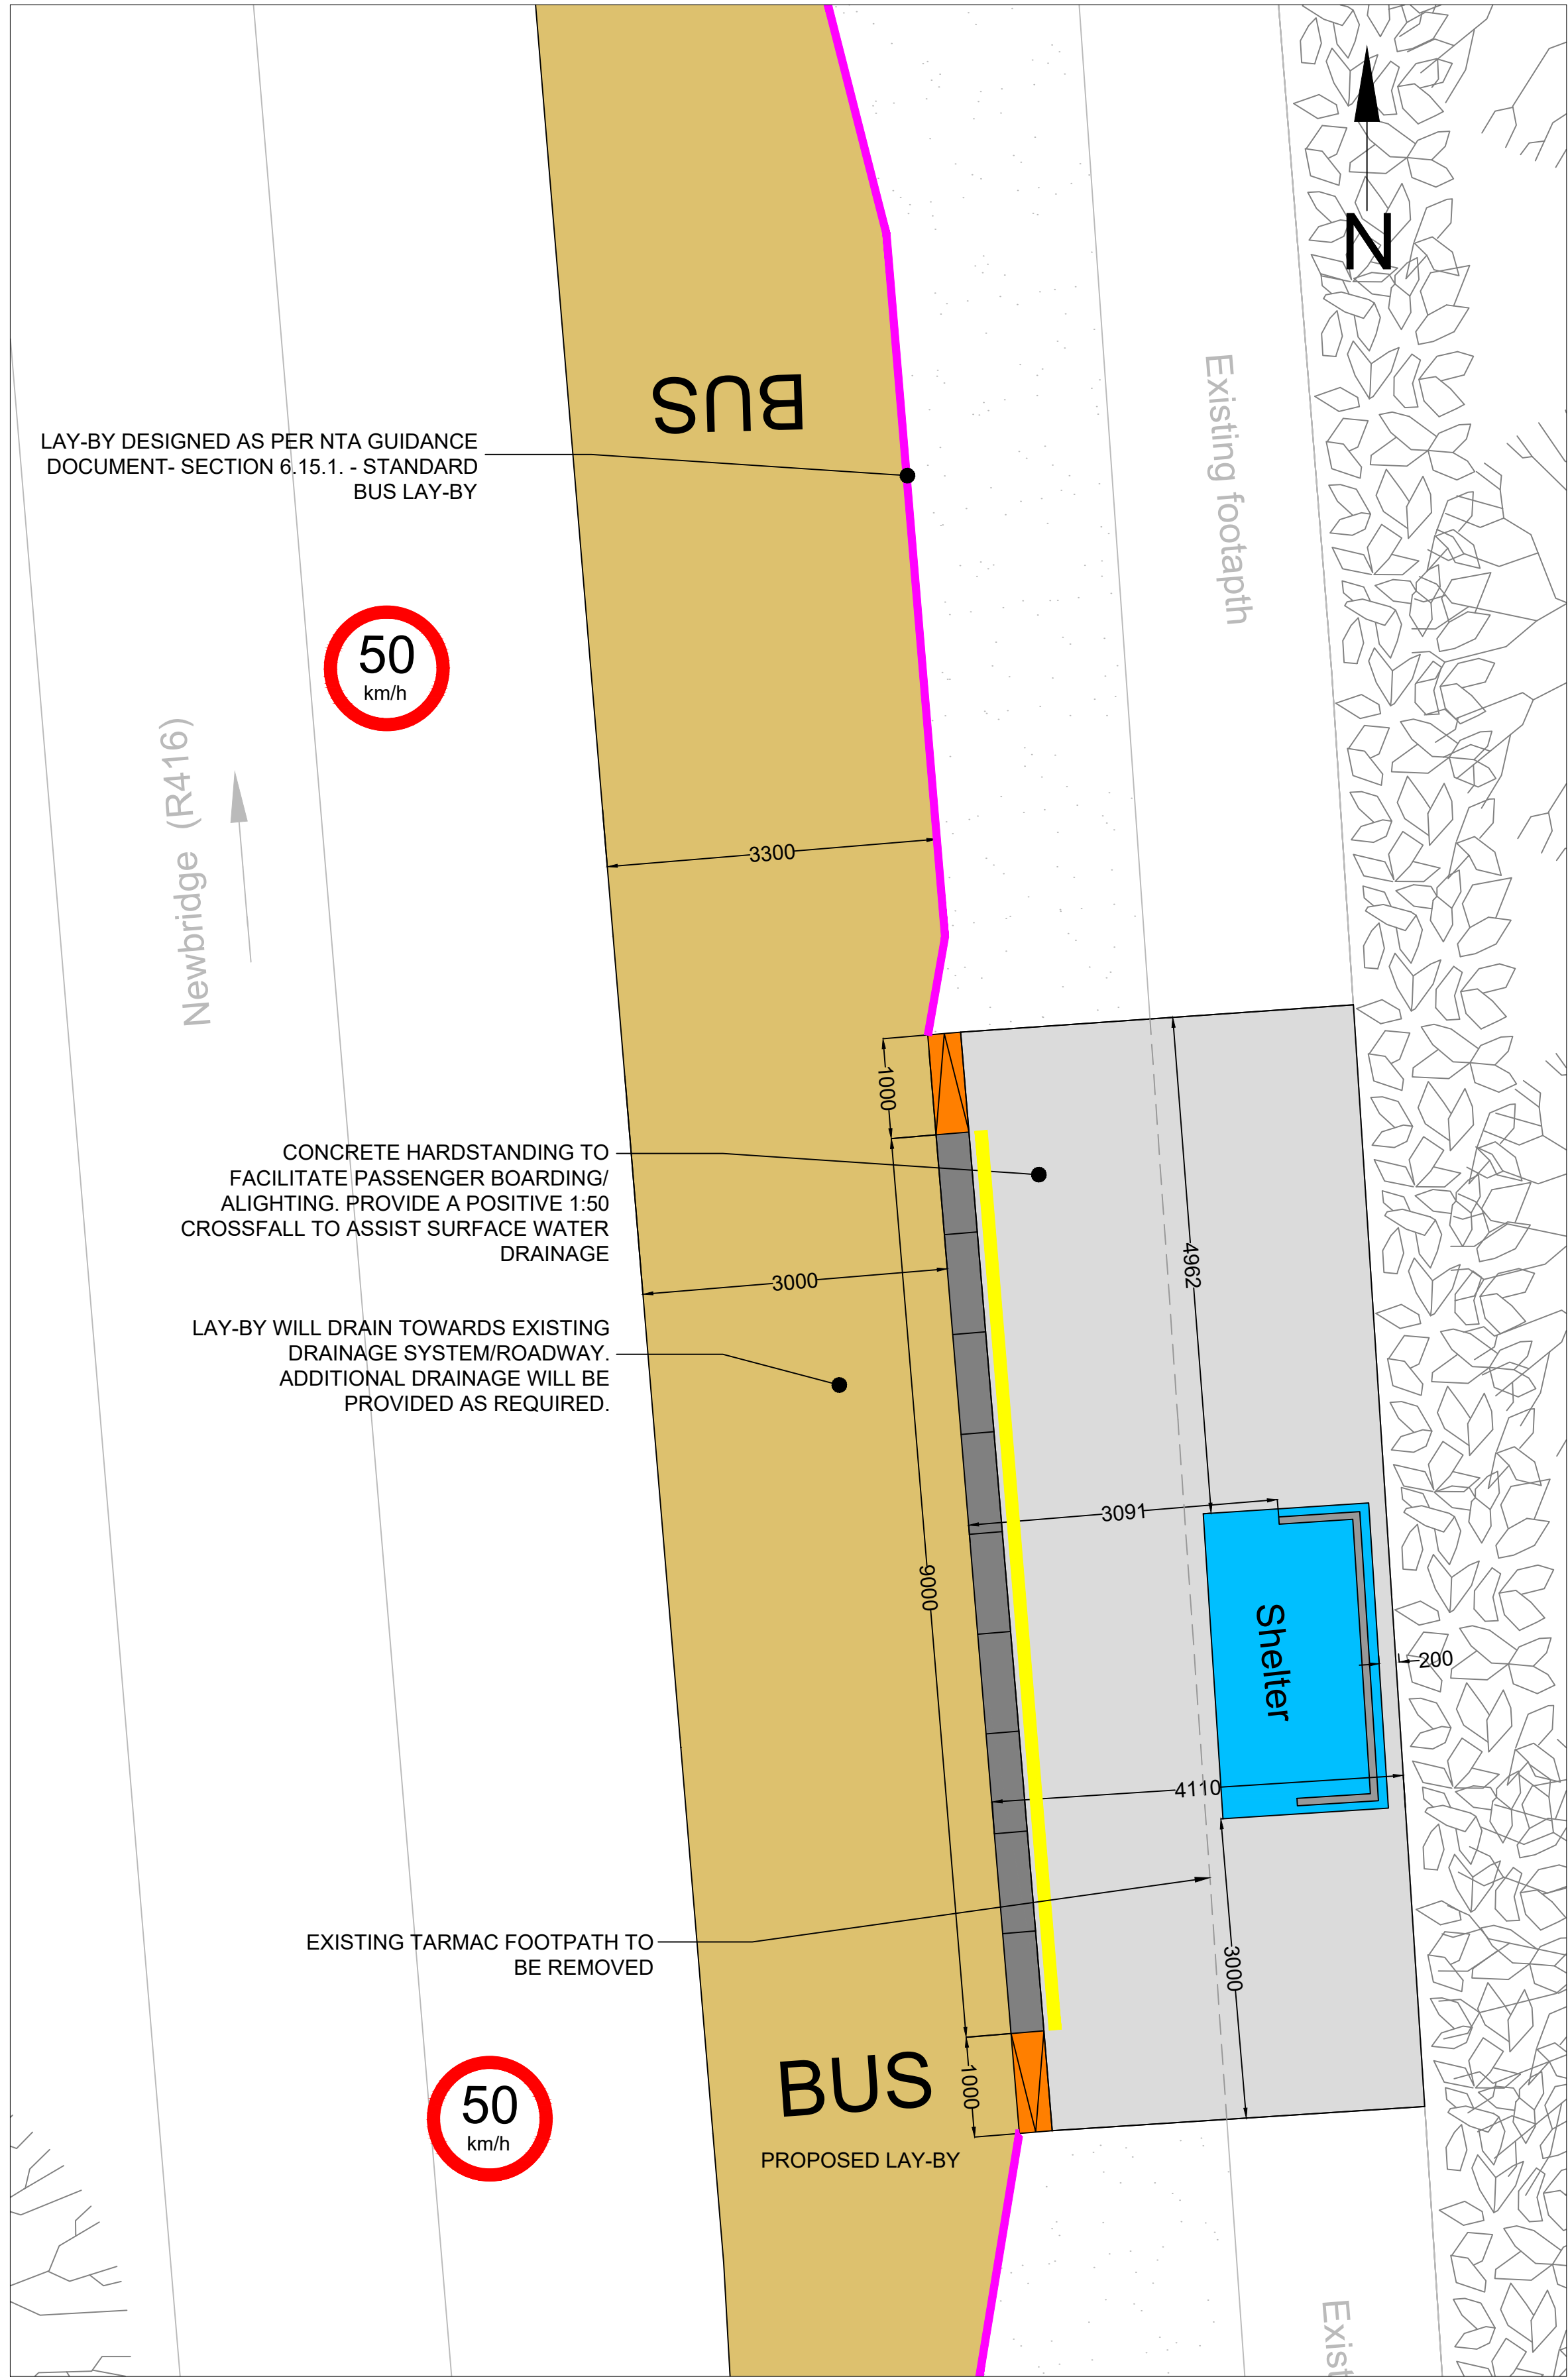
Detailed Layout Plan- South Bound Bus Stop
